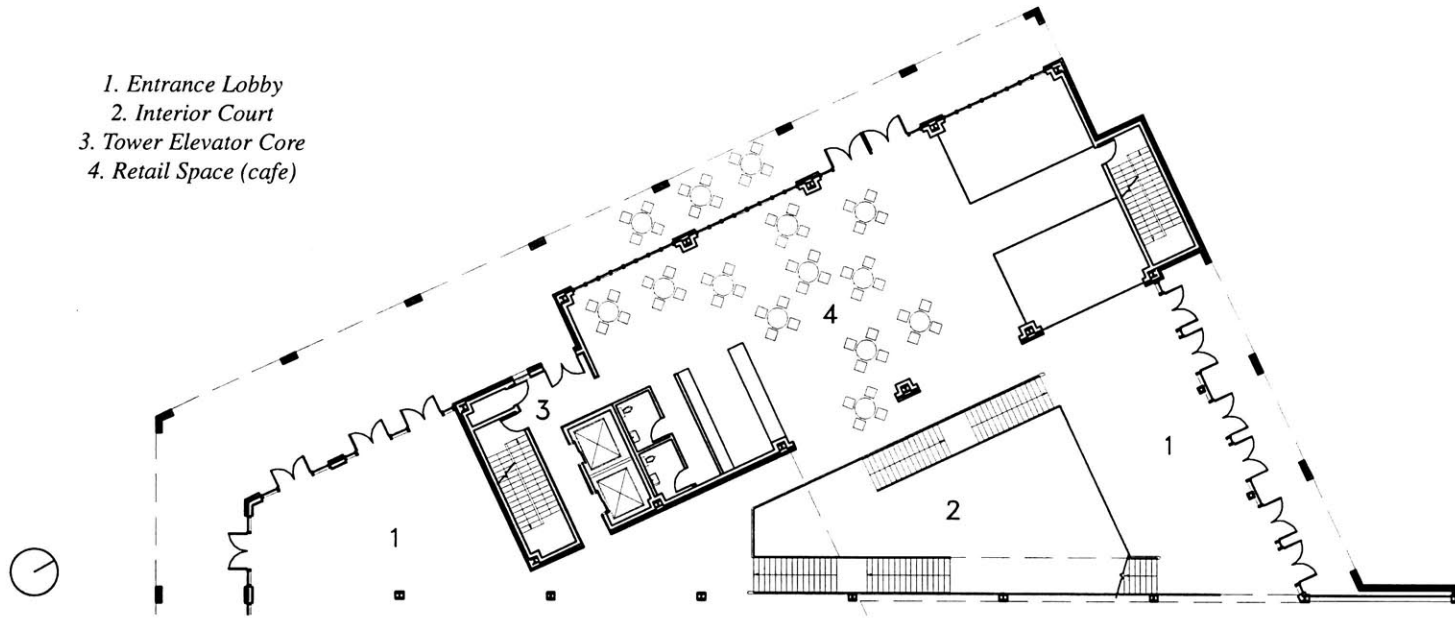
Plan detail of Ground Floor showing Community Business Resource Center tower and covered Interior Court (Scale: 1/32" = 1'-0")
